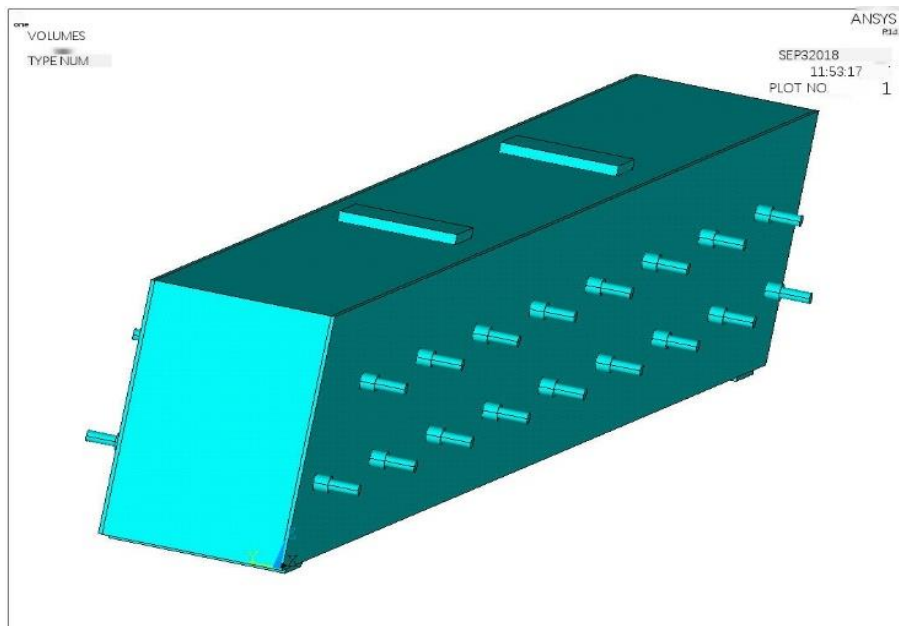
Structural diagram of steel plate brick masonry composite beam
